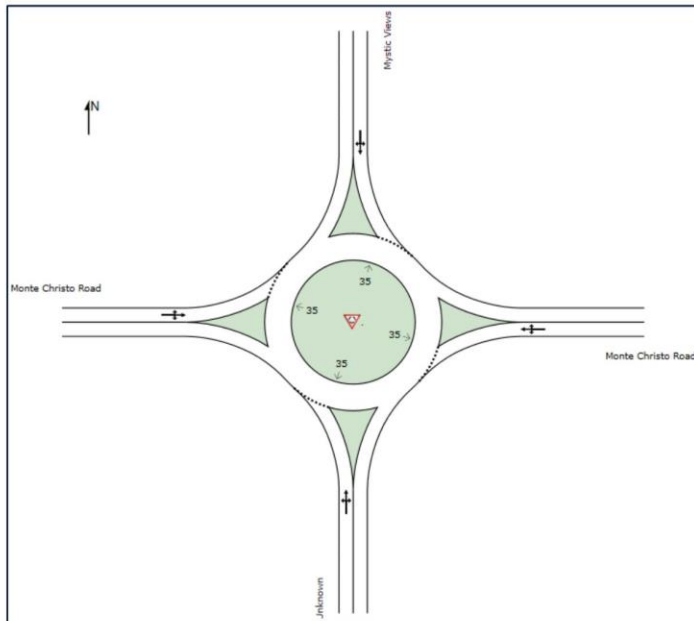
Monte Christo Road and Planned New Access Road Proposed Intersection
